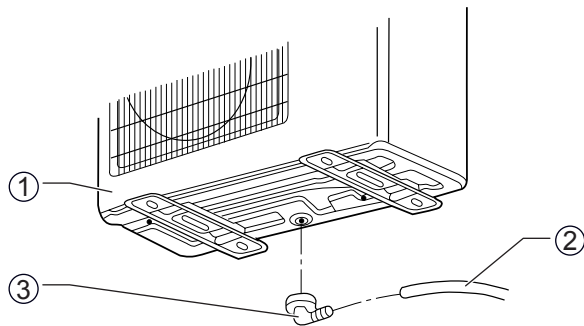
Assembly of the drainage elbow for condensed water.
